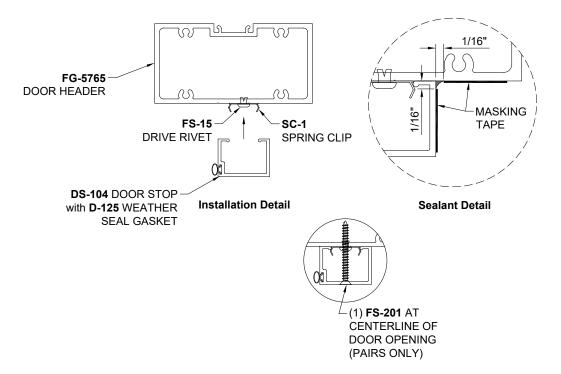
Attaching Door Stop to Concealed Closer Header and Sealing
